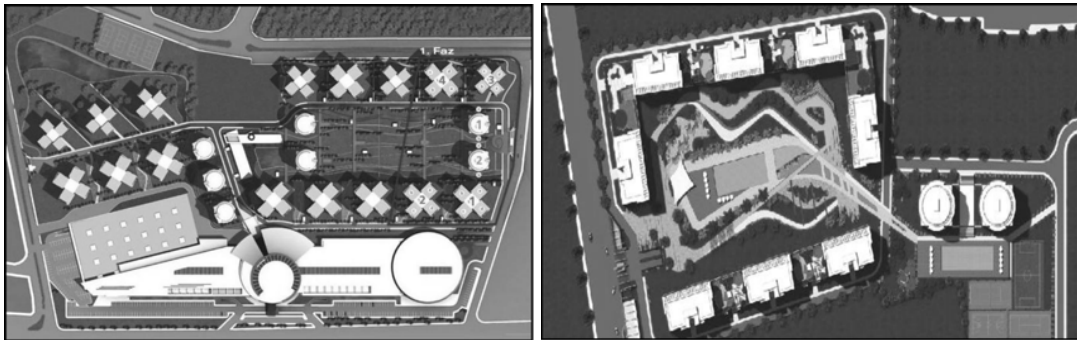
Initial site plan (left), Korupark Terrace site plan (right)
